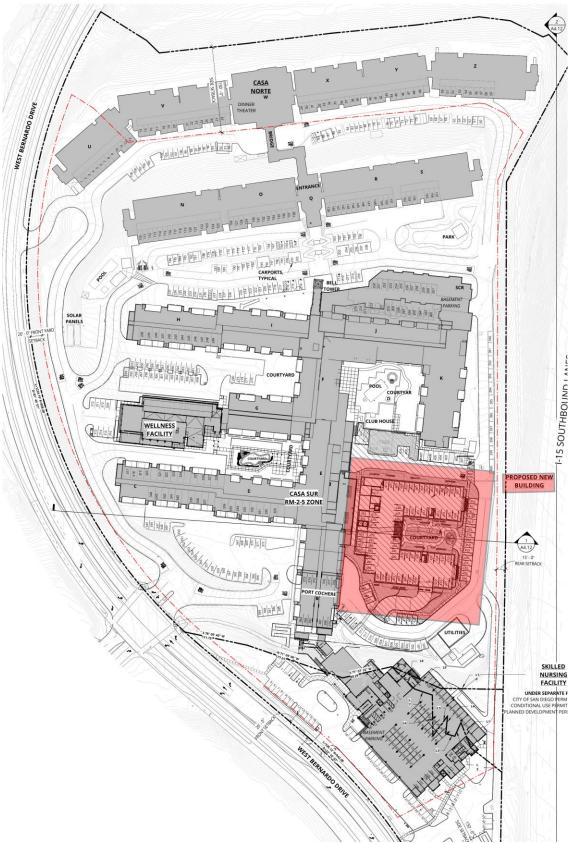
Casa de las Campanas Site Plan with Proposed Phase III Highlighted in Red
